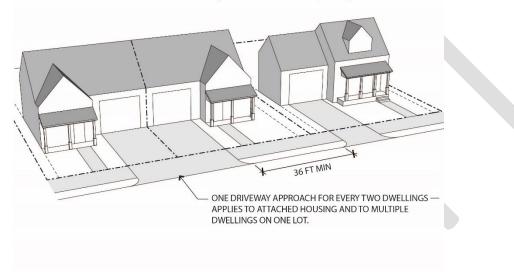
C.110.335-B: Paired Driveways and Minimum Spacing
